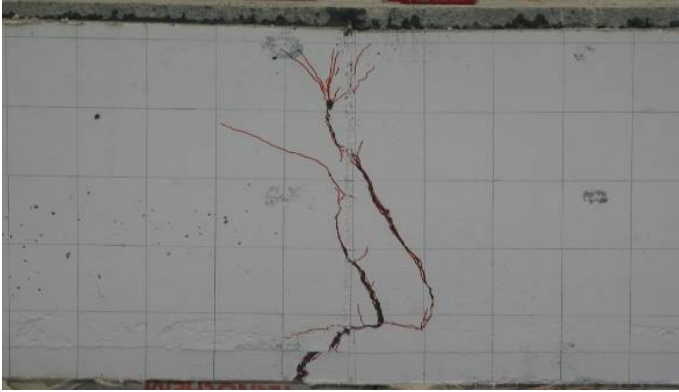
Plain concrete beam with HPFRCC jacket: main crack at failure.
